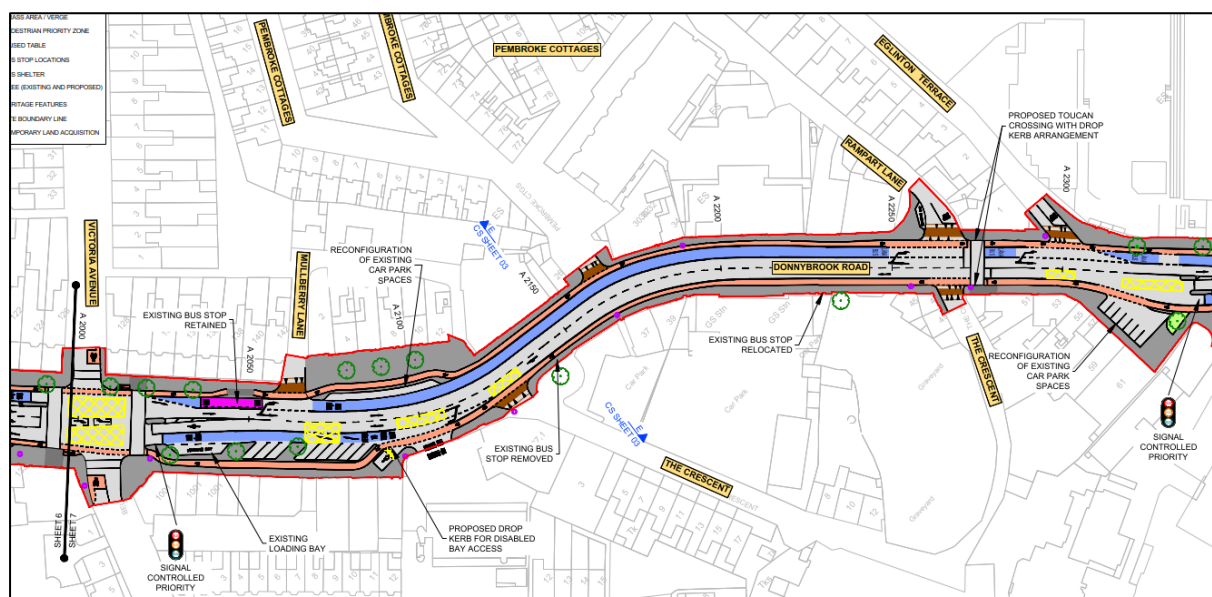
Extract from General Drawing Arrangement at Donnybrook Road (Sheet 07)
